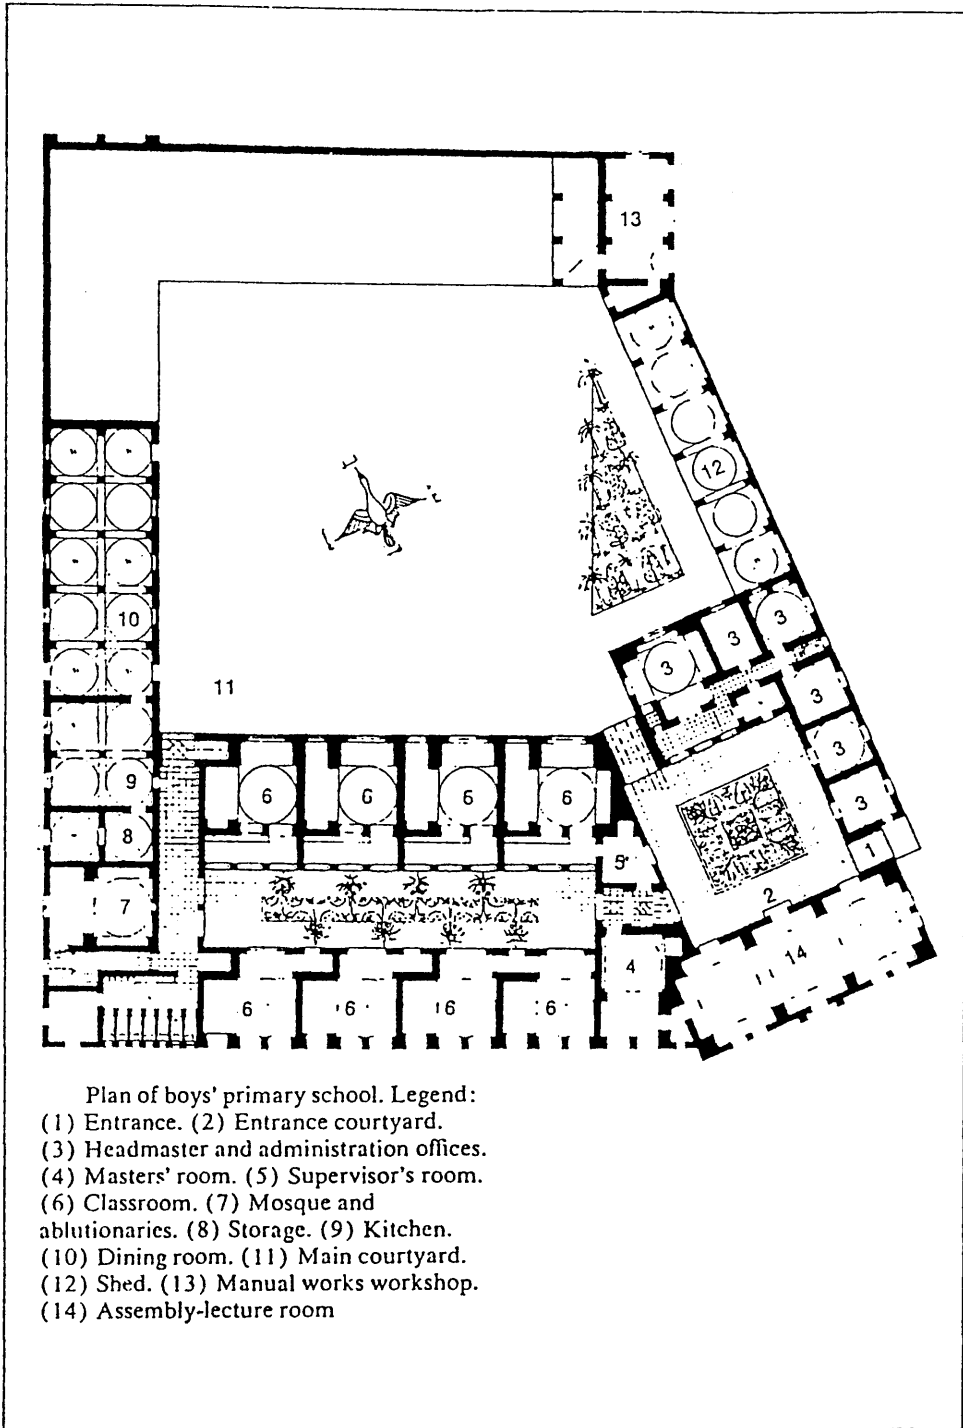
Heavy mass construction of boy's primary school in Egypt.
